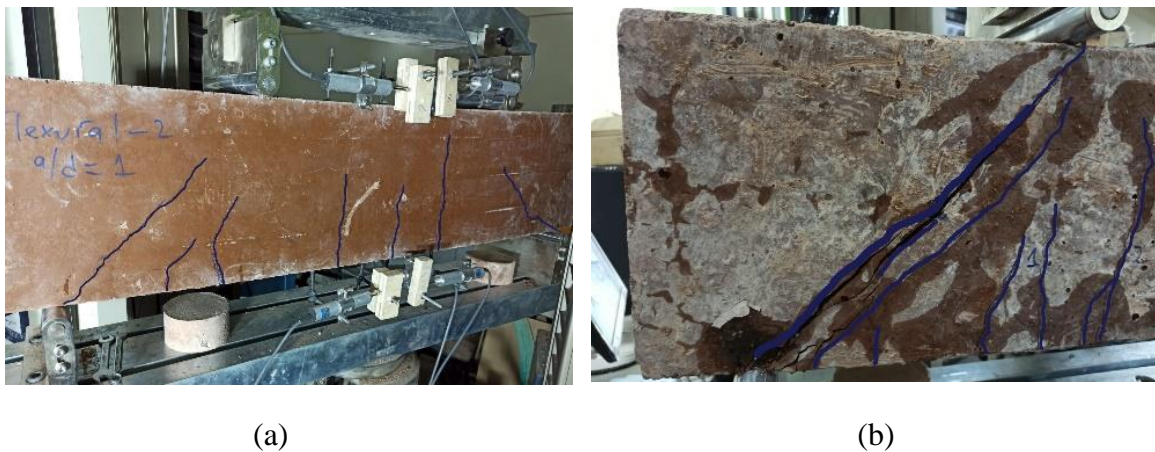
GPC – RA – 1.00 beam, (a) first cracks, (b) failure
